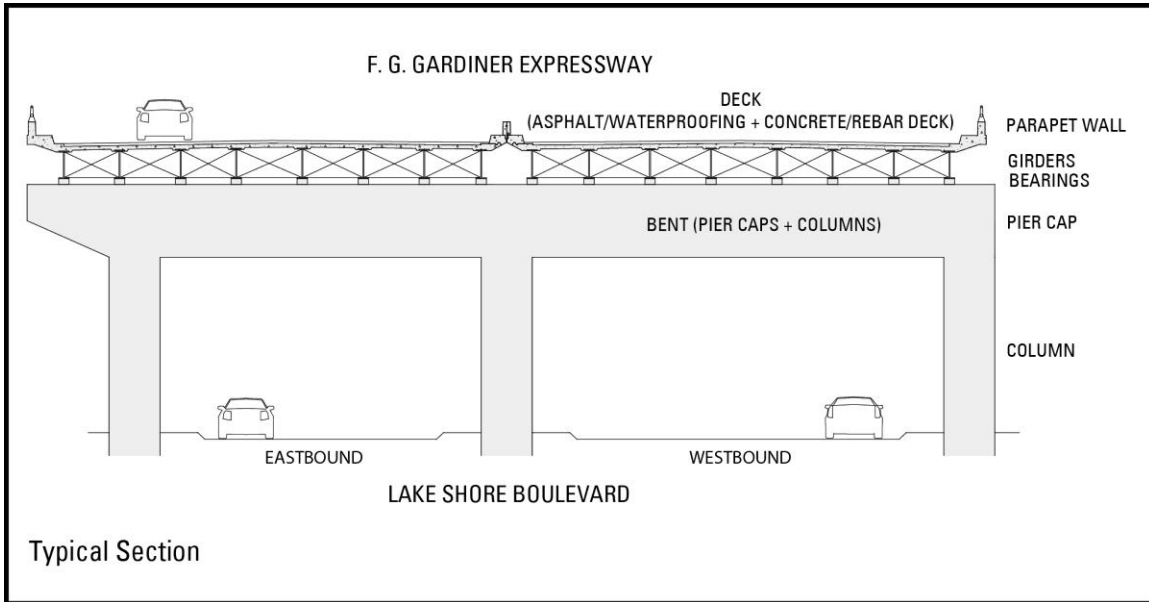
provides a typical cross-section of the structure of the Gardiner Expressway looking west in the areas east of Jarvis Street and west of York Street. The bents are composed of steel-reinforced concrete. Steel girders sit on top of the bents and provide the support for the steel-reinforced concrete deck. The deck is topped with an asphalt driving surface. Steel-reinforced concrete parapet walls keep vehicles in the travelled portion of the expressway and provide support bases for streetlights and directional signs.
